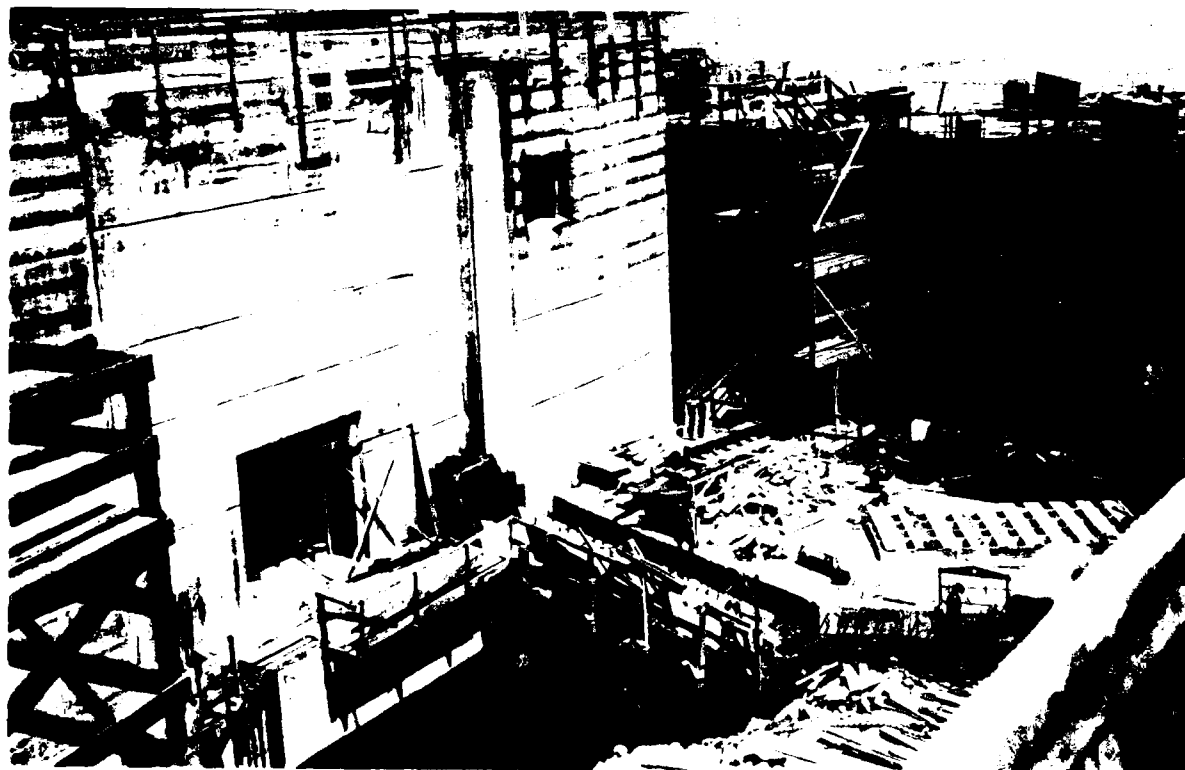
Construction of new river wall monoliths and miter sill, August 1979, Lock No. 3, Monongahela River
